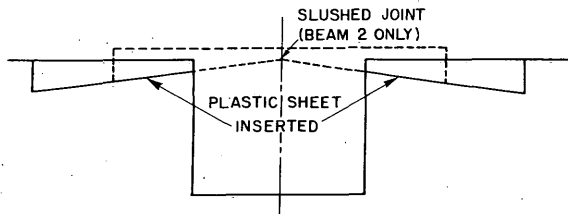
Double cantilever or haunched beam. Taper 18 in. to 6 in.; Width: 18 in. Peter snow 12 in. deep was placed on beam 2 for the full 16 ft.
